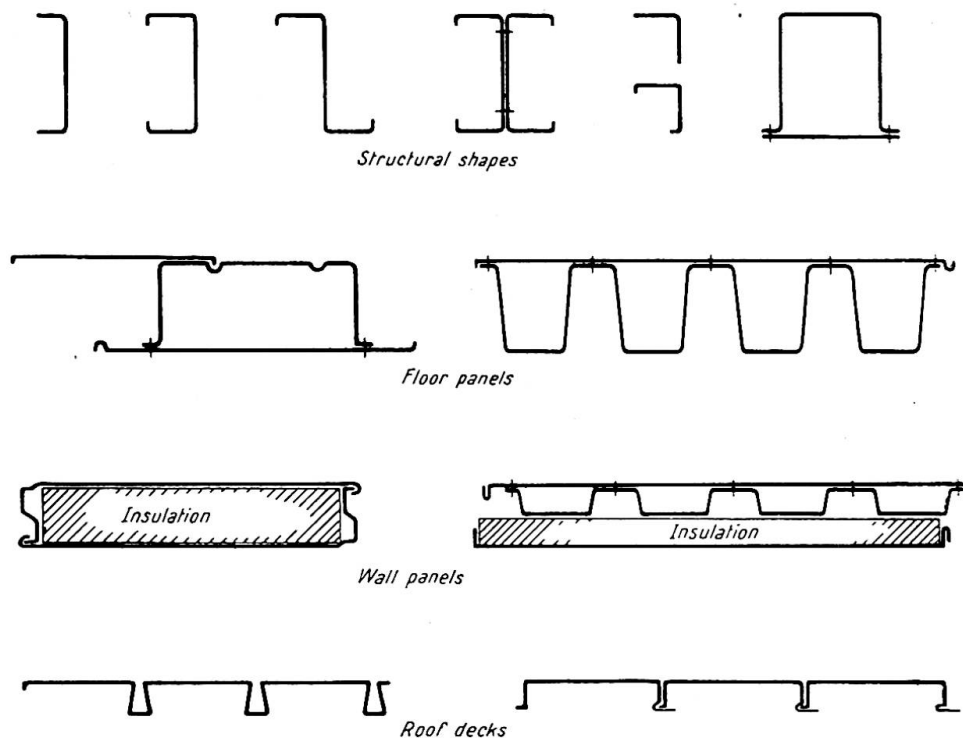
Some current light-gauge steel structural shapes (panel and deck sections of H. H. Robertson Co., Detroit Steel Products Co., and Truscon Steel Co.)
